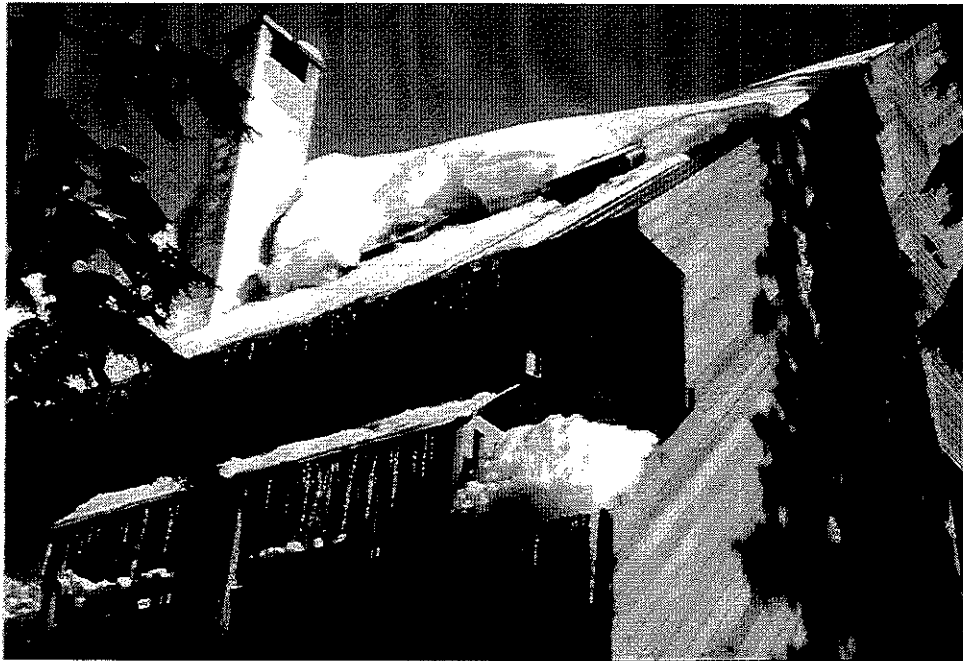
Chimney part way down roof slope is holding back sliding snow.
